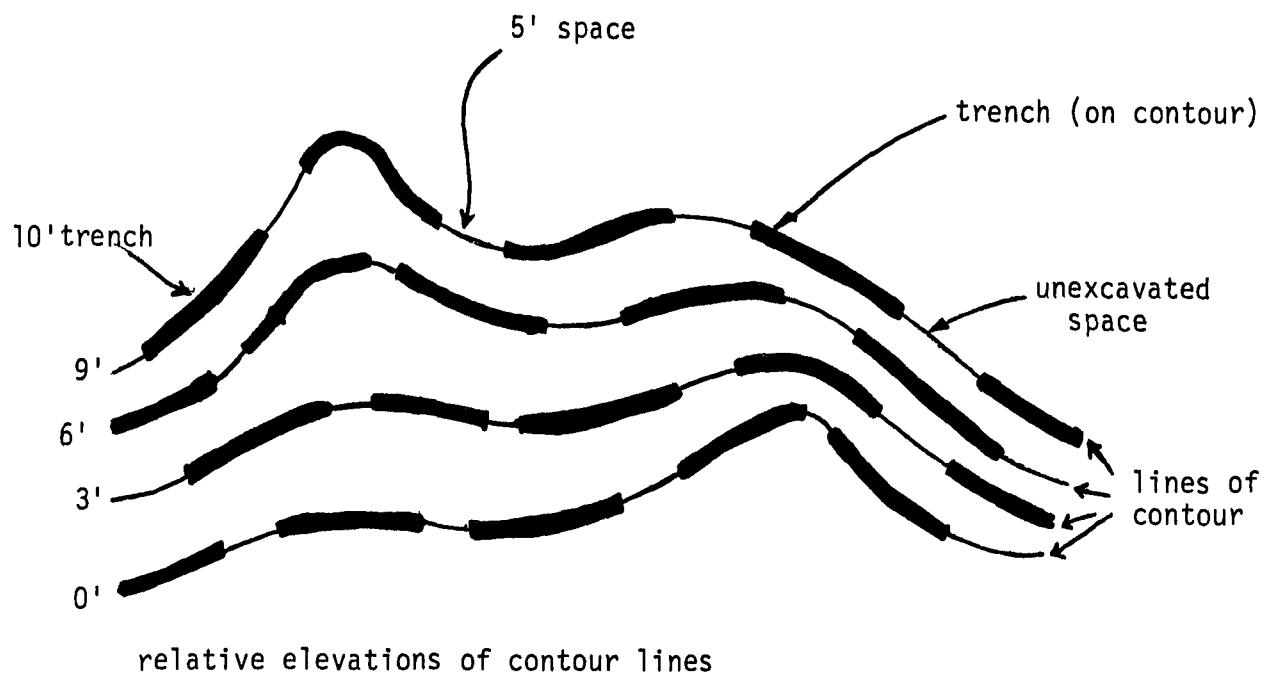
Planimetric view of contour trenches (thick lines) dug on level contours (thin lines; note elevations).
